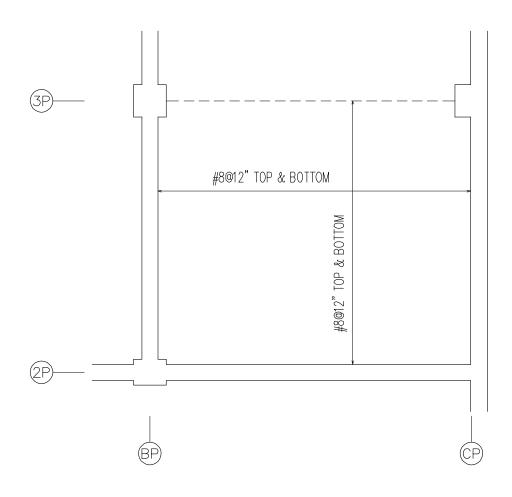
Typical Reinforcement in Floor at Elevation 3'-7"- AREA 1 (Between Column Lines BP & CP - 2P & 3P) Security-Related Information - Withhold Under 10 CFR 2.390
